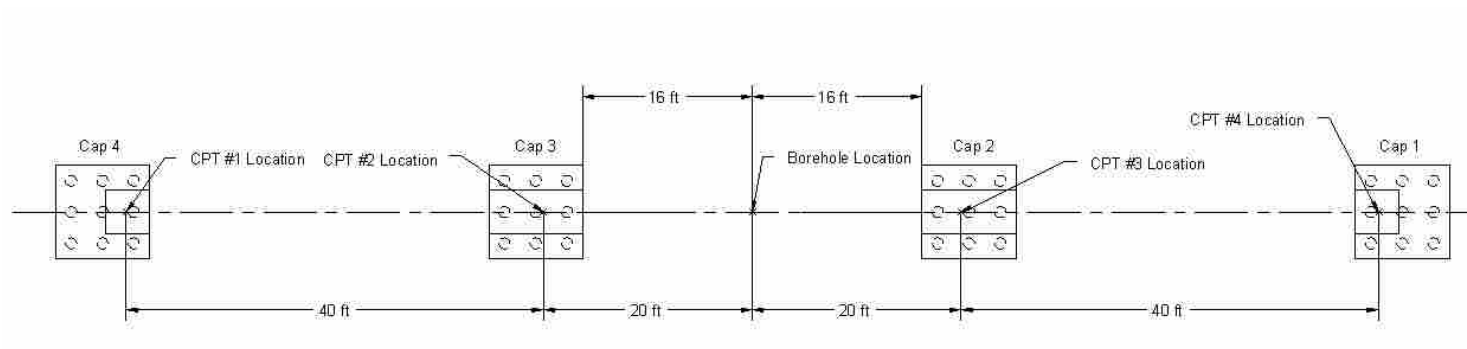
Plan view showing location of boring and CPT soundings relative to completed pile caps.
